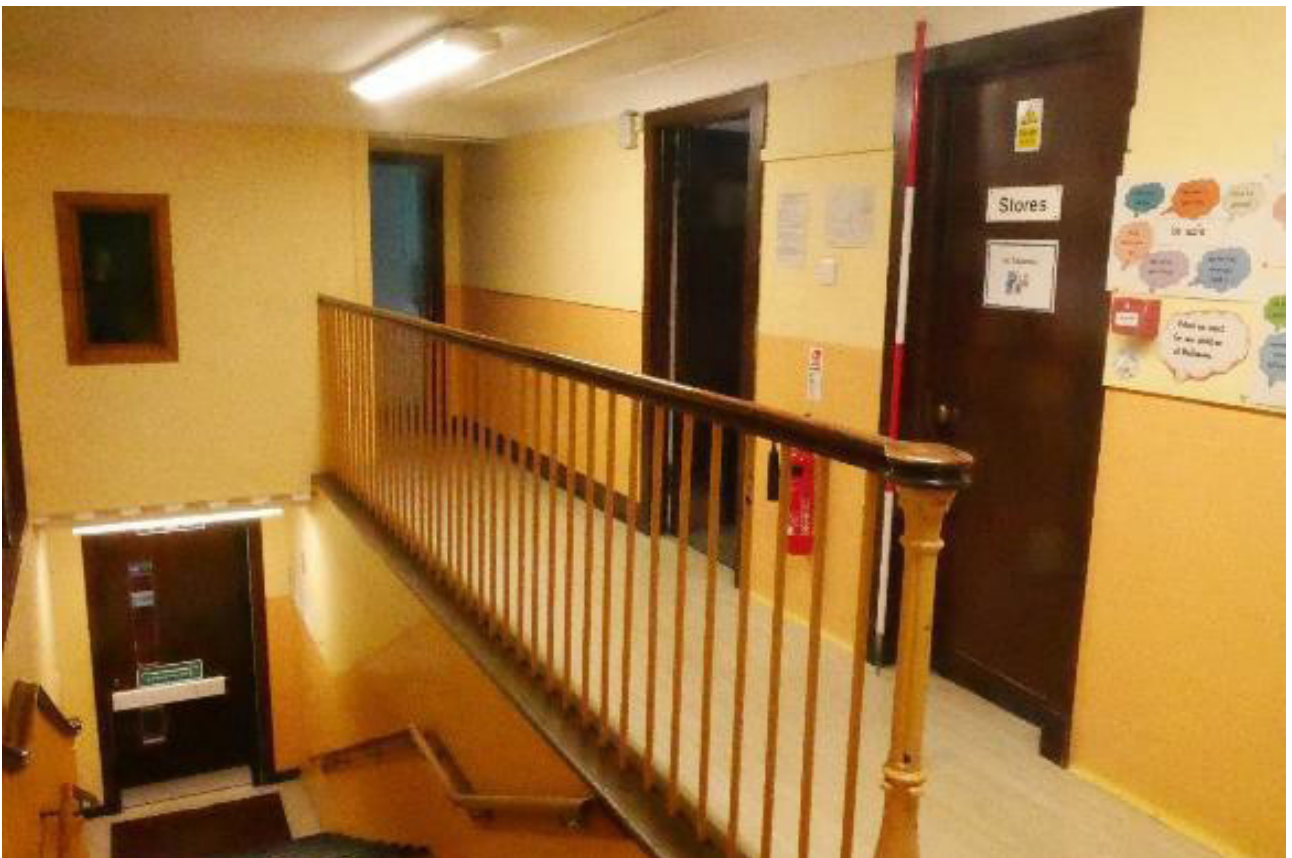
General view of south mezzanine corridor, looking NNW (© Derek Hall 2023)
